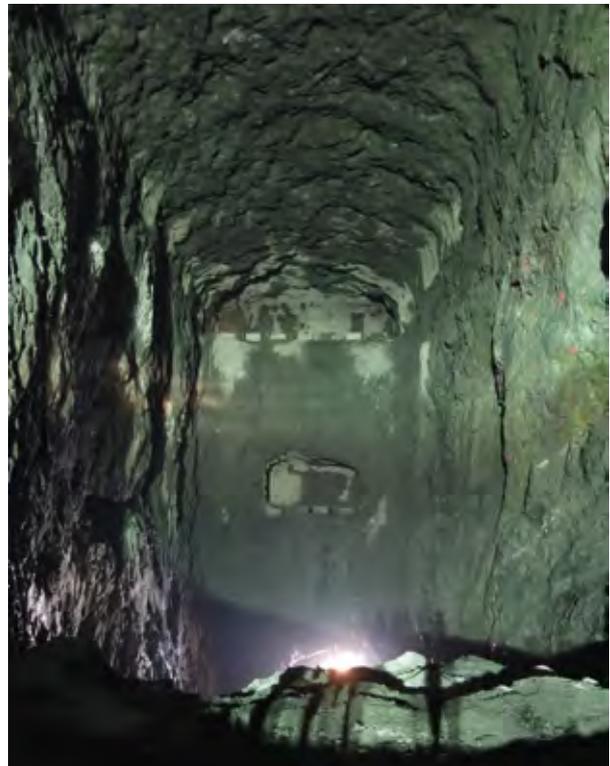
Photo showing access tunnels at different levels at the south end of the cavern. Photo by FSA, Multiconsult.
